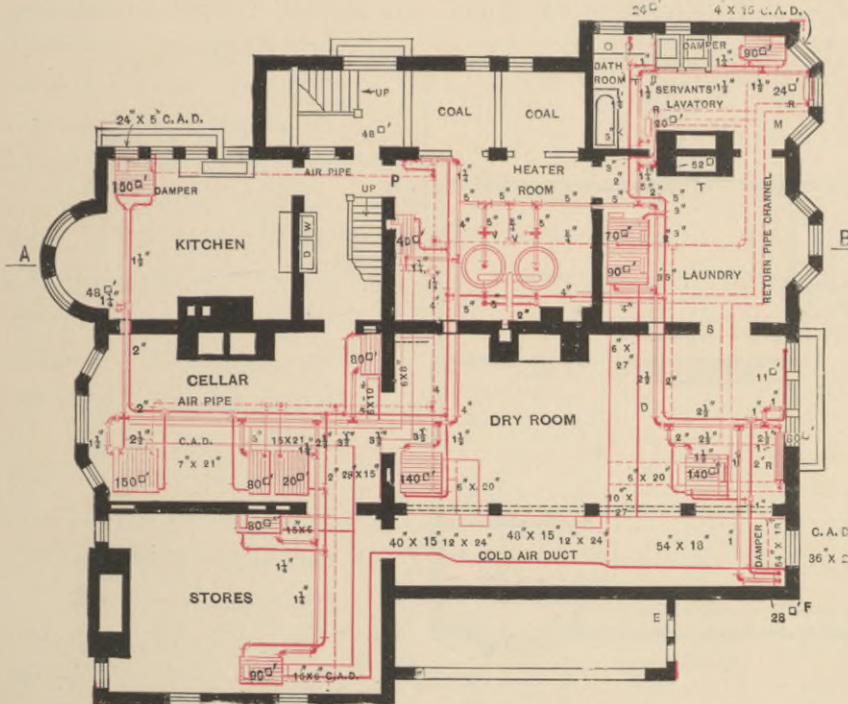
Plan of Basement. Scale  $\frac{1}{8}$  inch to the foot.
